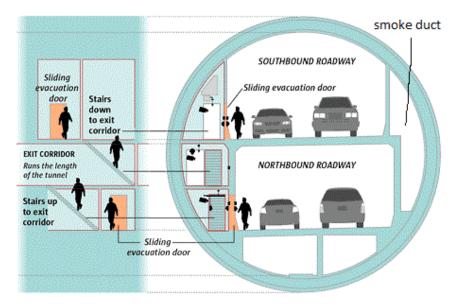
SR99 Tunnel cross section with southbound and northbound roadways (Source: Washington State Department of Transportation, WSDOT)
